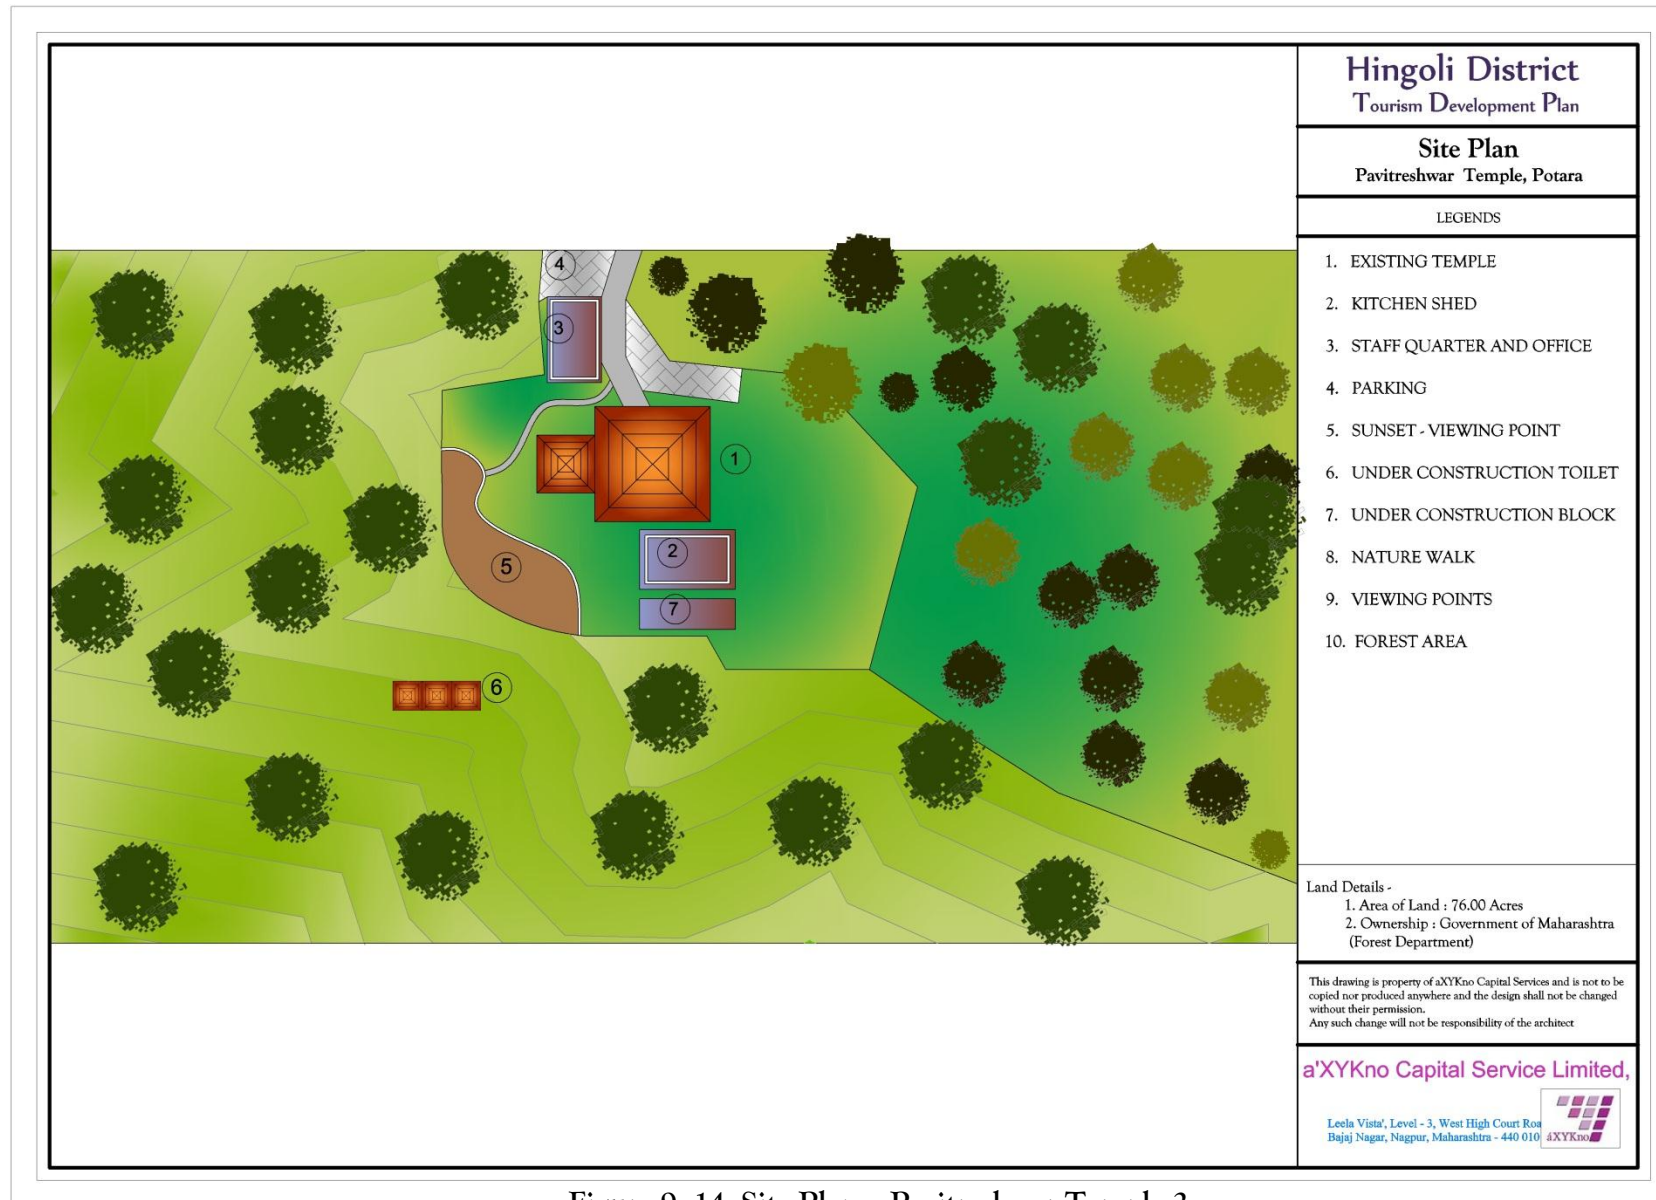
14: Site Plan – Pavitreshwar Temple 2
